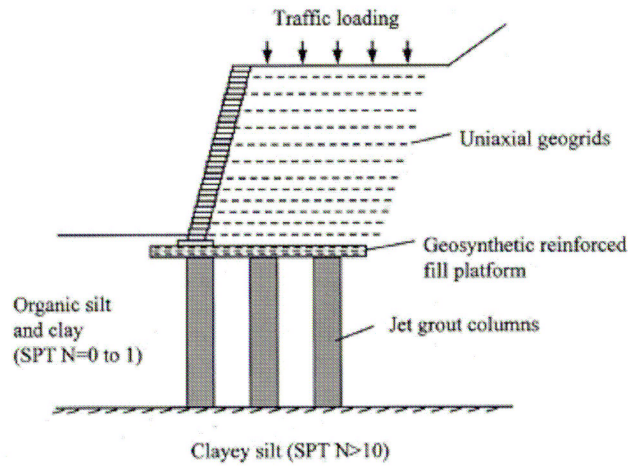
Segmental Retaining Walls (Alzamora et al., 2000)
